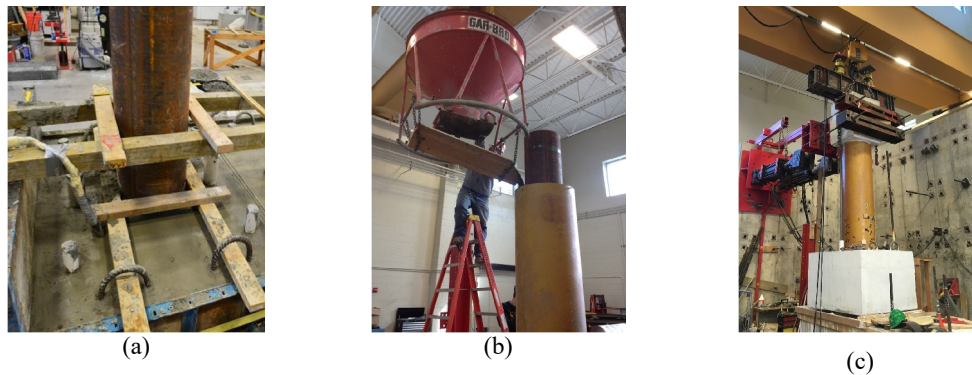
Constructing procedure (a) footing casting around the inner steel tube; (b) placing the FRP tube and pouring the concrete wall; (c) the HC-FCS column
